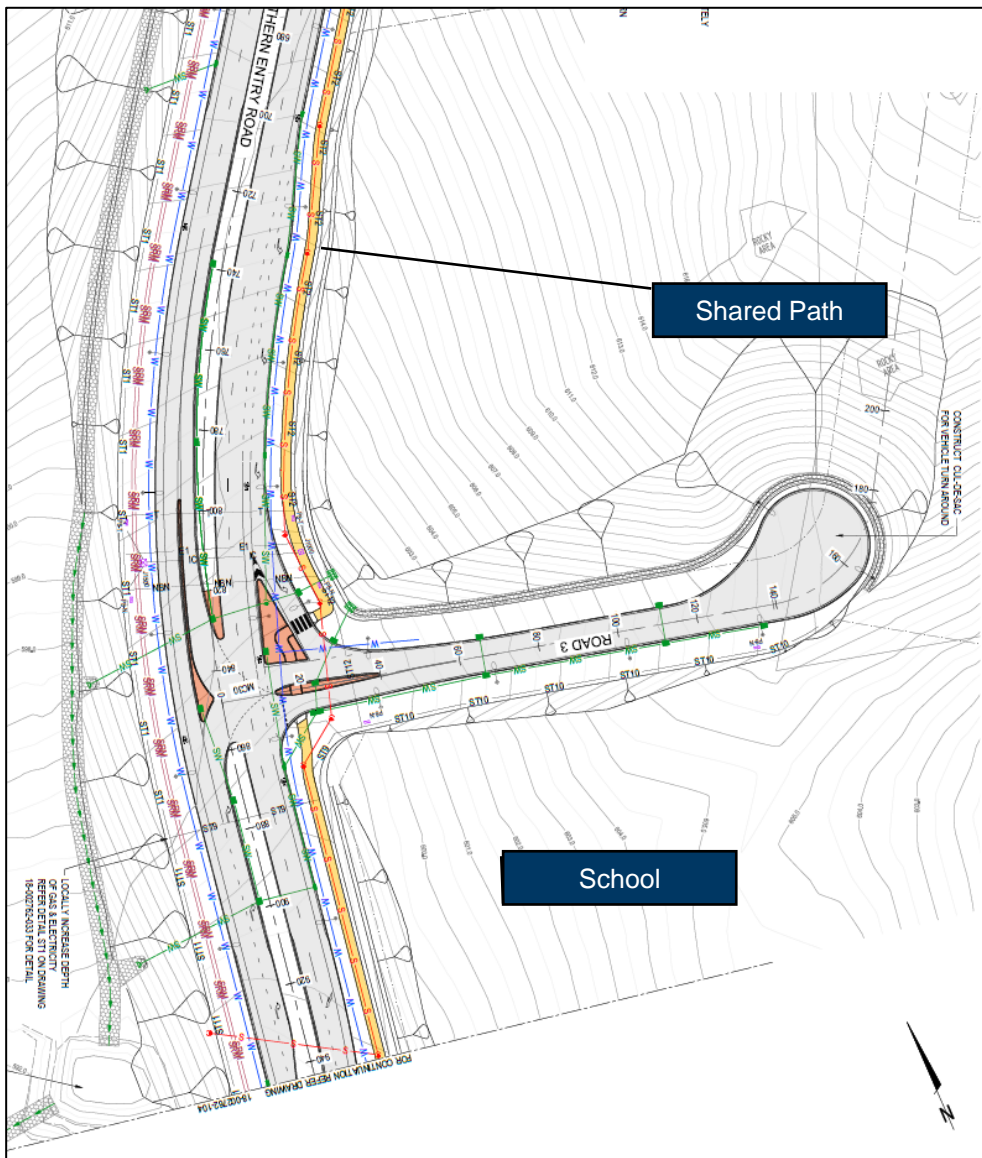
New high school in Jerrabomberra subject site and surrounding road network
